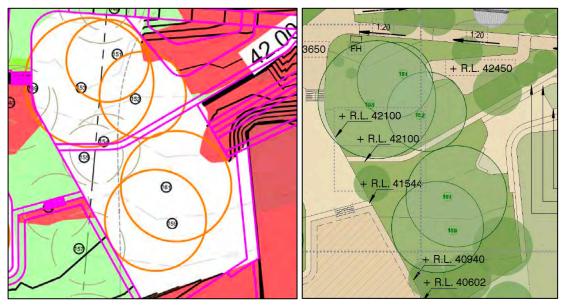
& 53: The Site Plan (Left) and Drainage Plan (right) in relation to neighbours tree 353 can be observed. (Source: Left - Architectural Plan Set by Djrd Architects Issue 6 dated 20/01/2025 and Right - stormwater And Subsoil Drainage Plan from Complete Plan set, by TTW Rev 4 Dated 22/1/2025).
